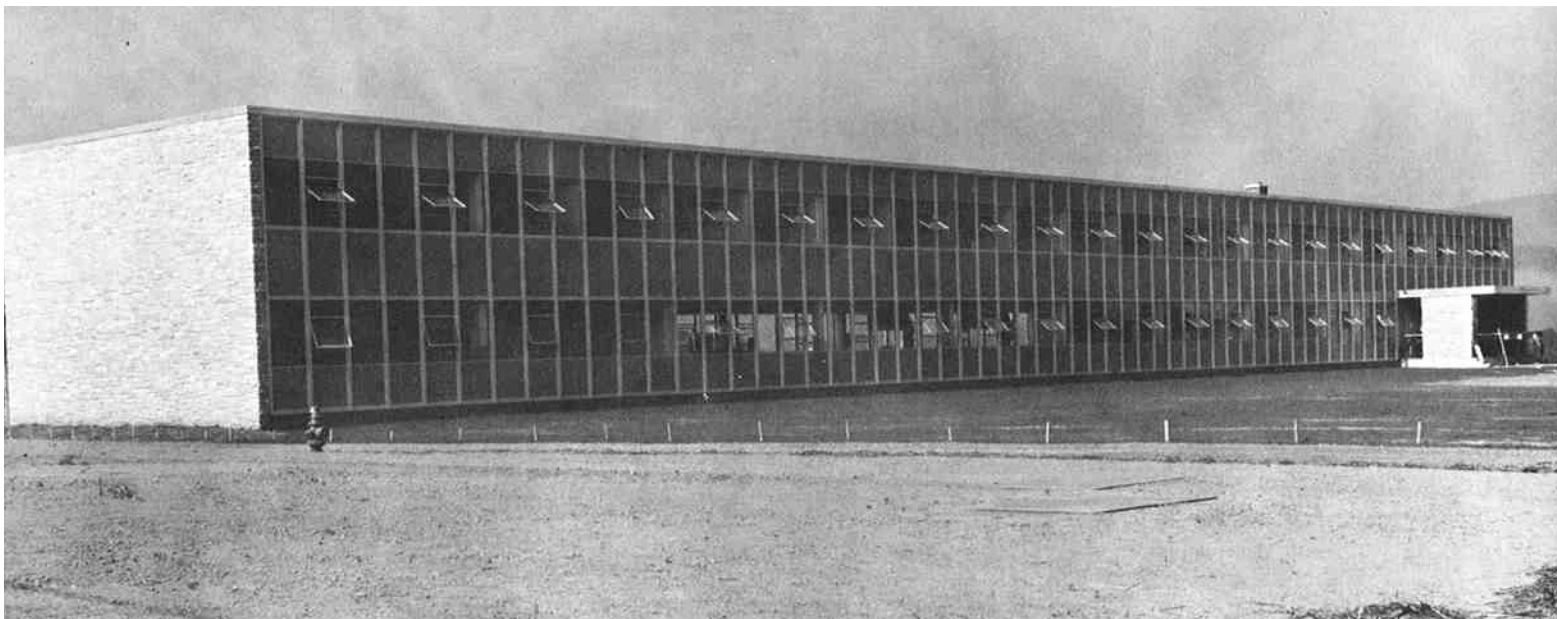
The nearly completed central section of the Laboratory. The second floor provides for the office of the Director, the Astronomy and Administration Departments, library and conference rooms. The first floor accommodates offices, laboratories, shop and stock rooms for the Research Equipment Development Department, and offices for engineering and construction. Dark room facilities are located in the full basement.
